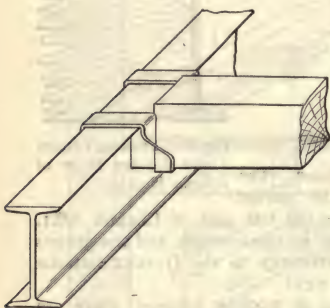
Wooden Beam Framed to I Beam with Stirrup-hanger
